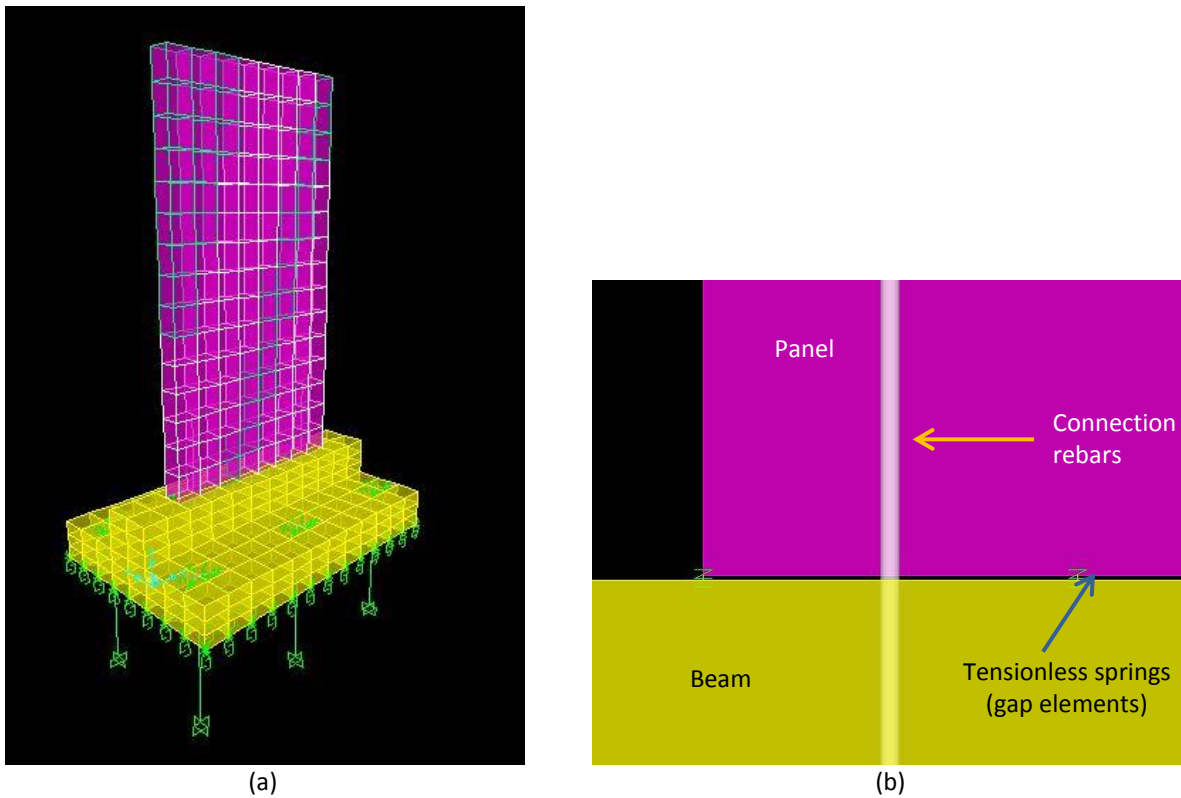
(a) F.E. numerical model of the specimens; (b) detail of the connections.
